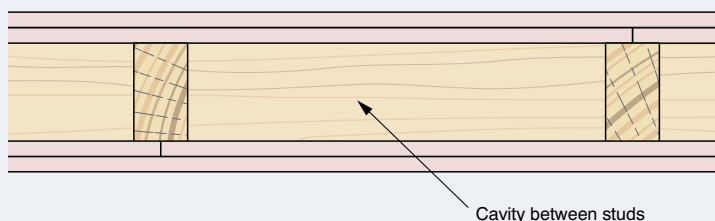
Horizontal section through typical FRL90/90/90:RISF45:NC timber stud wall showing allowable cavity.
